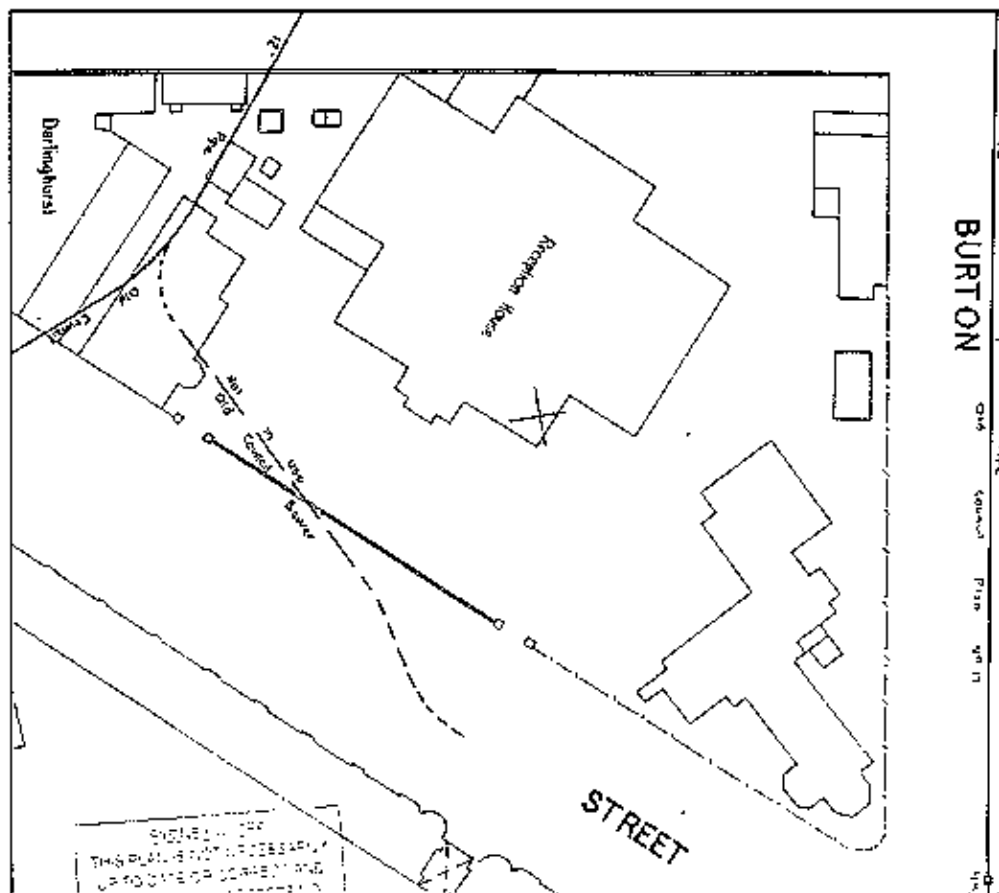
Extract from the 1884 Metropolitan Detail Series Plan showing the configuration of the Reception House and associated buildings. (Mitchell Library MZ Ser 4 811.17/1 Sheet L1)
